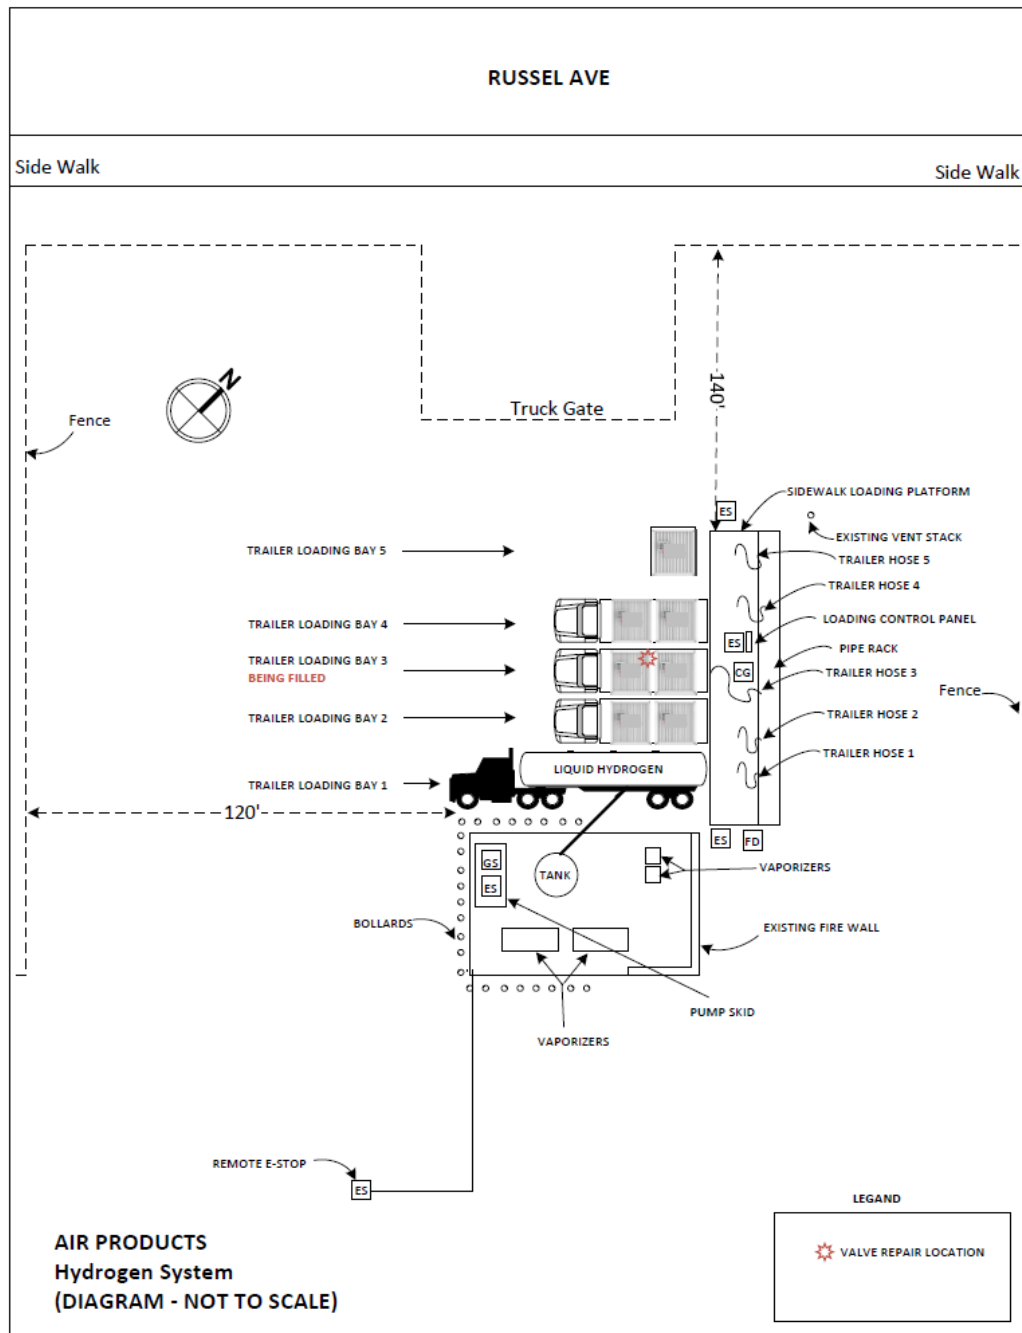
Air Products Hydrogen Transfill Facility Plan View (not to scale; from Fire Department report)
